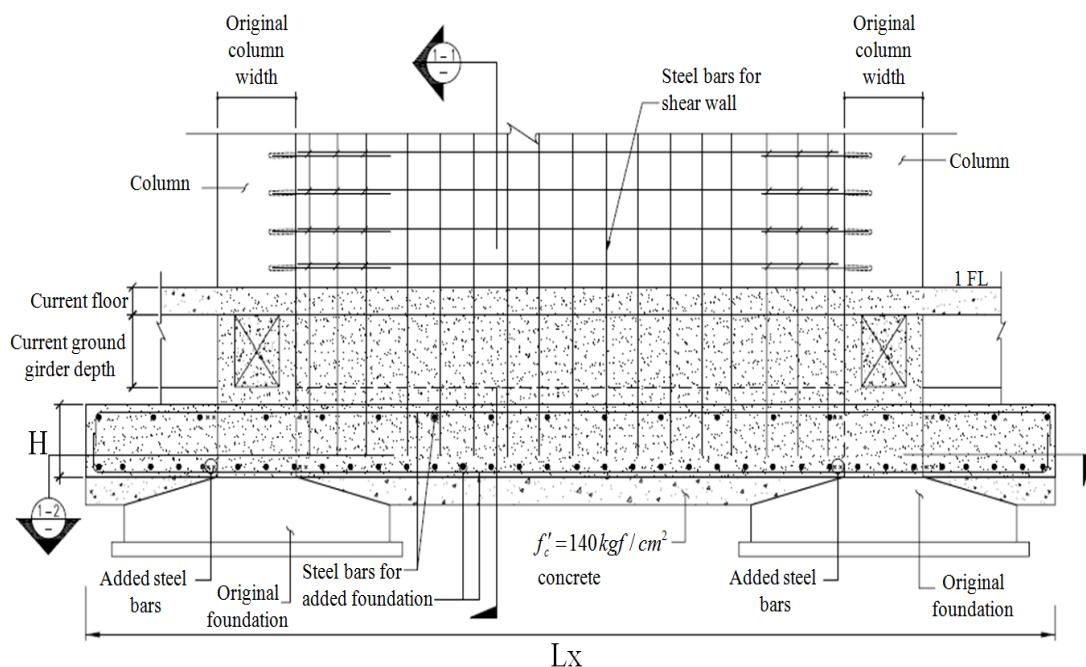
Second method of column foundation reinforcement (Chen, 2015)
